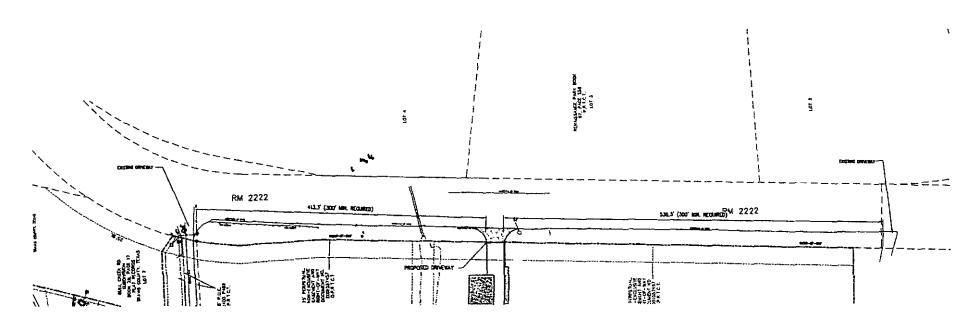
EXHIBIT M - DRIVEWAY DETAILS - (3 of 5)
